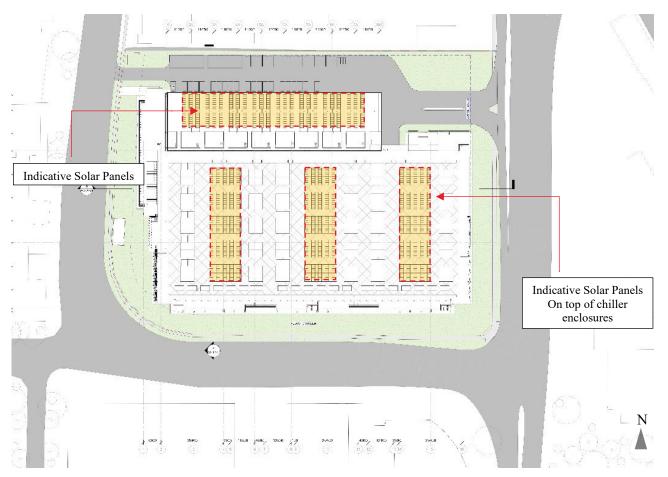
Proposed Roof plan, mark-up on drawing received from Grimshaw on 24/03/2025
